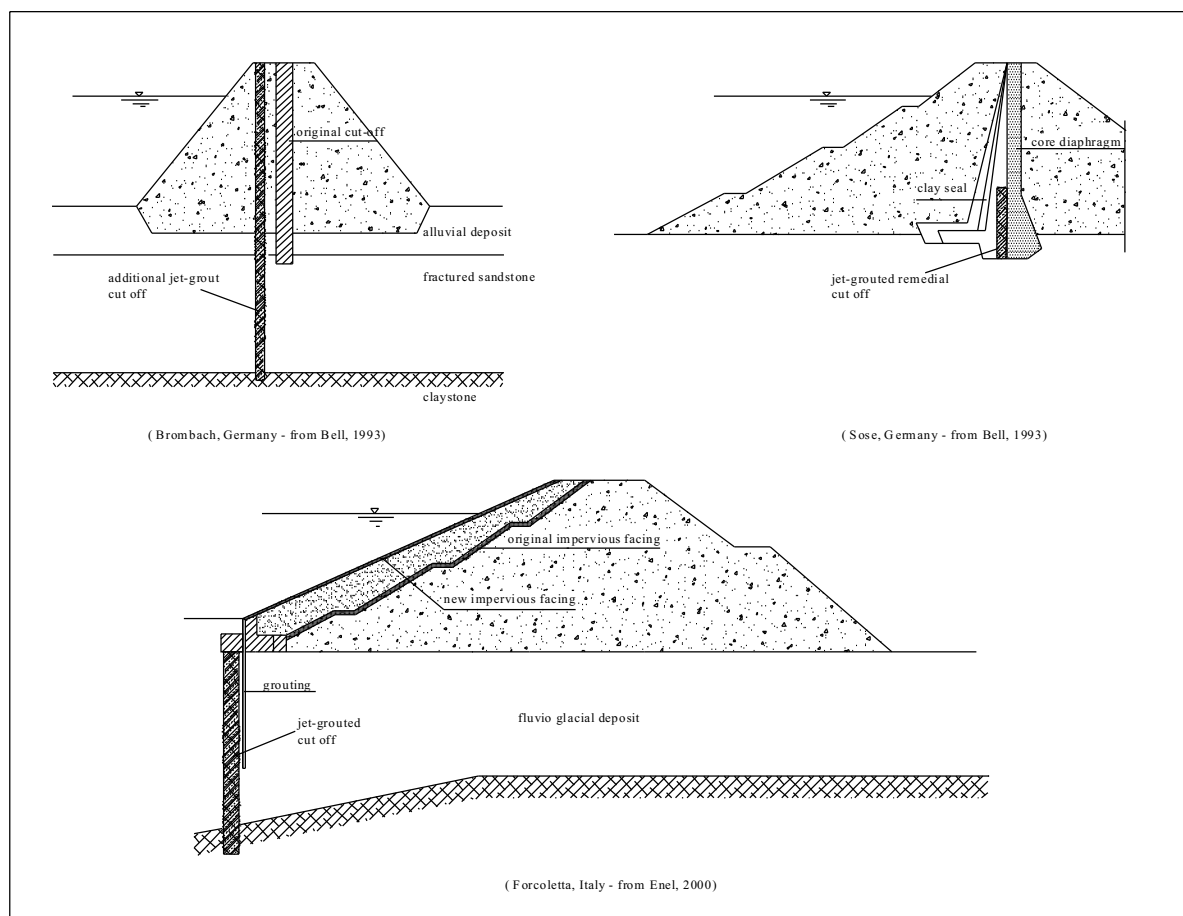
Jet grouted cutoffs installed after dam construction (remedial work)
